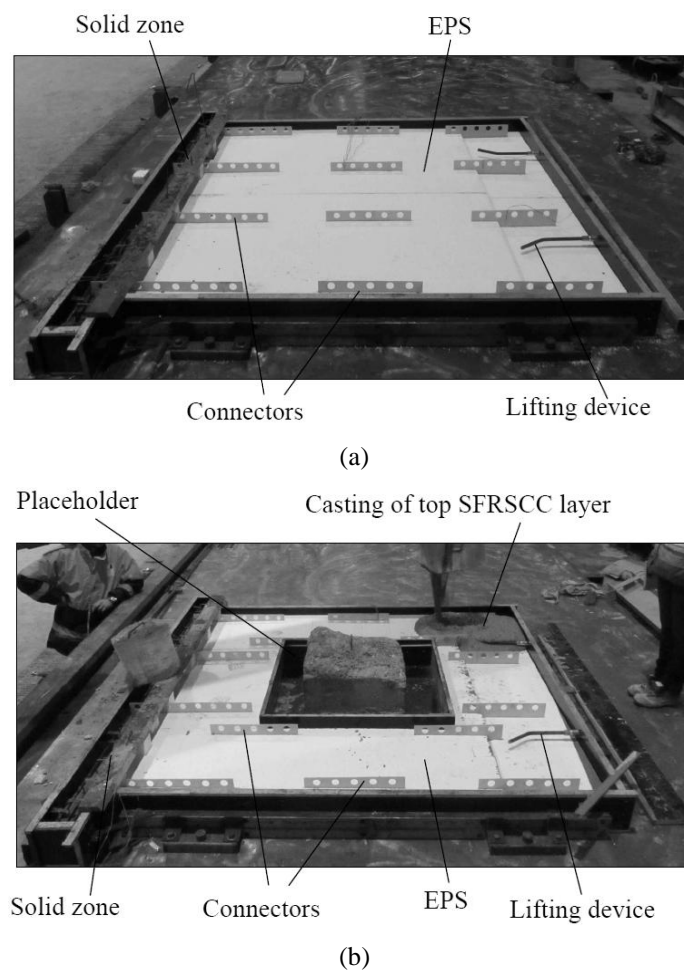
Manufacturing process of sandwich panels: (a) panels without opening and (b) panels with opening.
